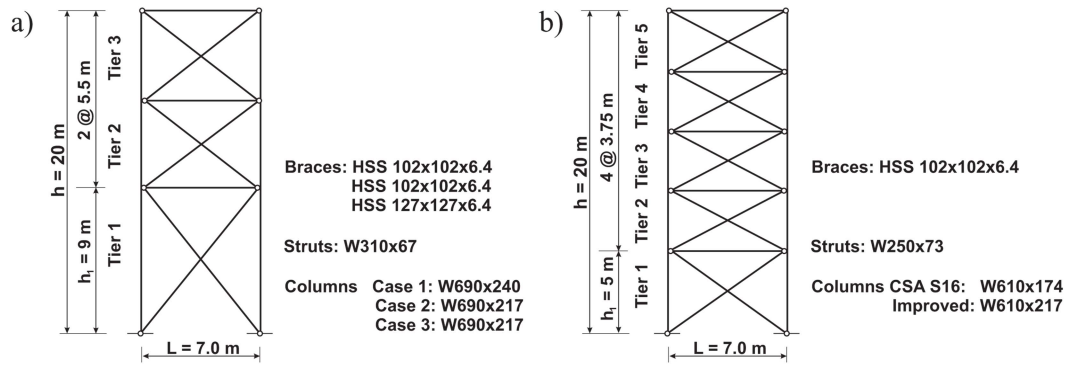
Elevation of the: a) 3-tiered, and b) 5-tiered braced frames.
